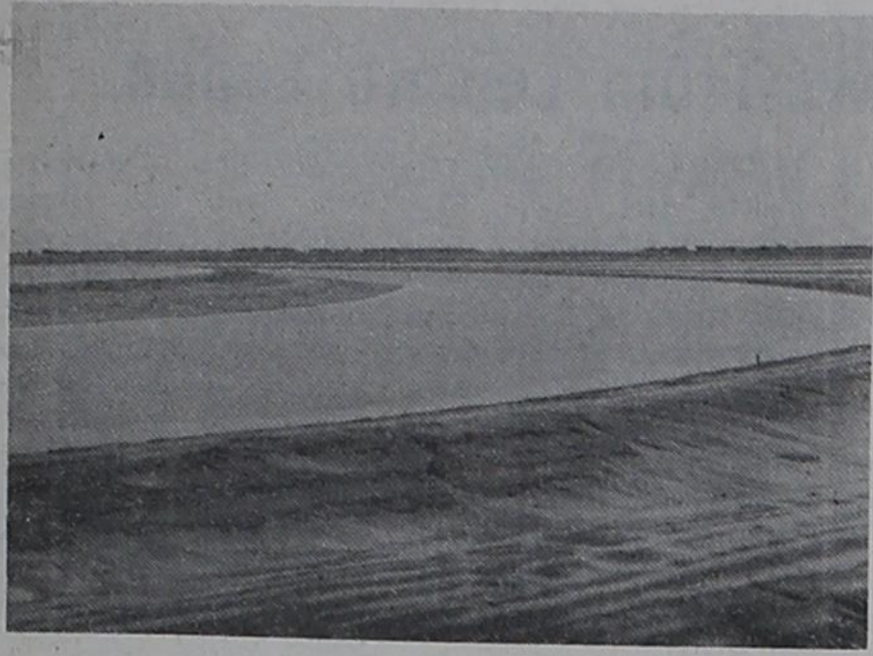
PHOTO SHOWS Water impounded from back toe to front toe on level parallel terraces constructed around hill. Note stake marking front toe.
